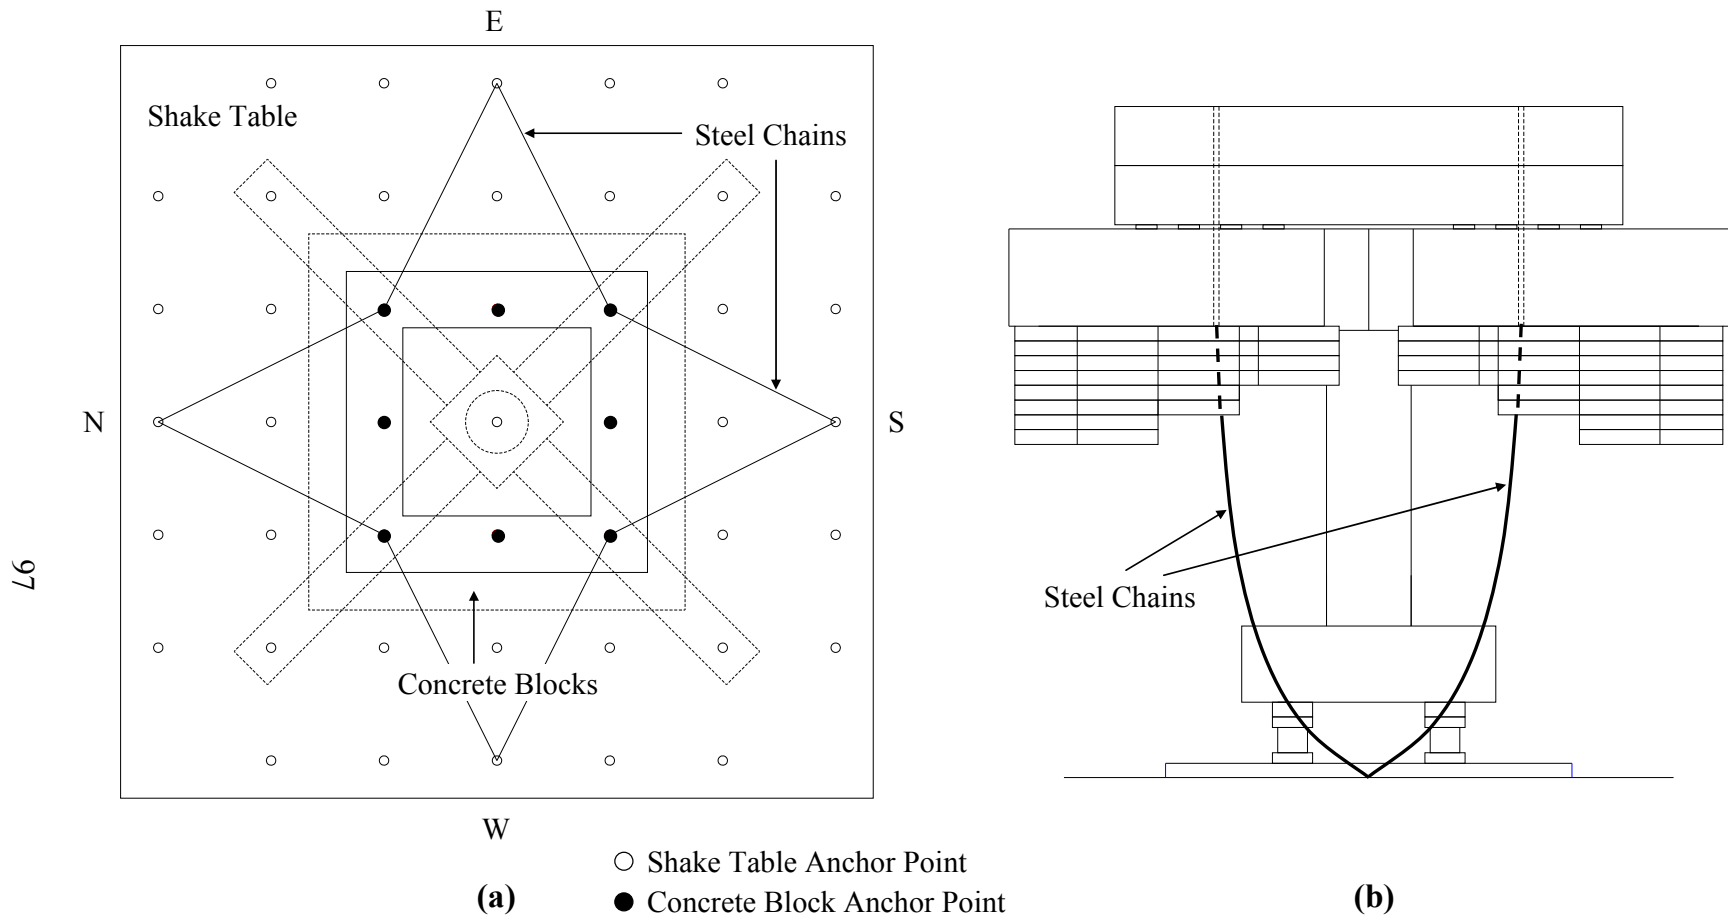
Specimen location on the shaking table and the catching safety system (a) Plan view, (b) Elevation view
